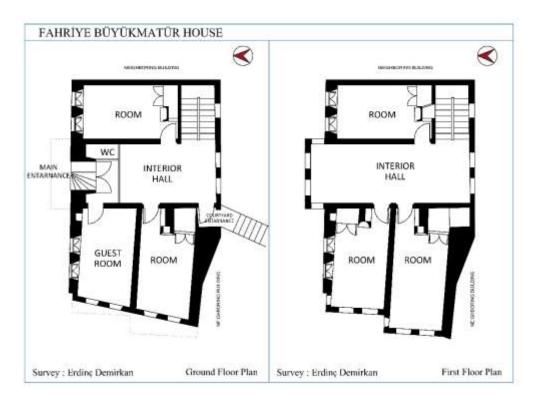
Fahriye Büyükmatür House Ground and First Floor Plan
